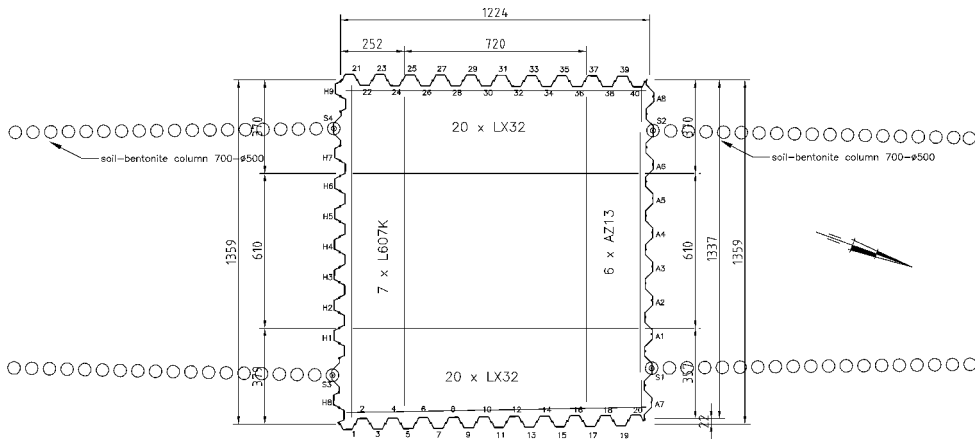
Topview of the Rotterdam Sheet Pile Wall Field Test
